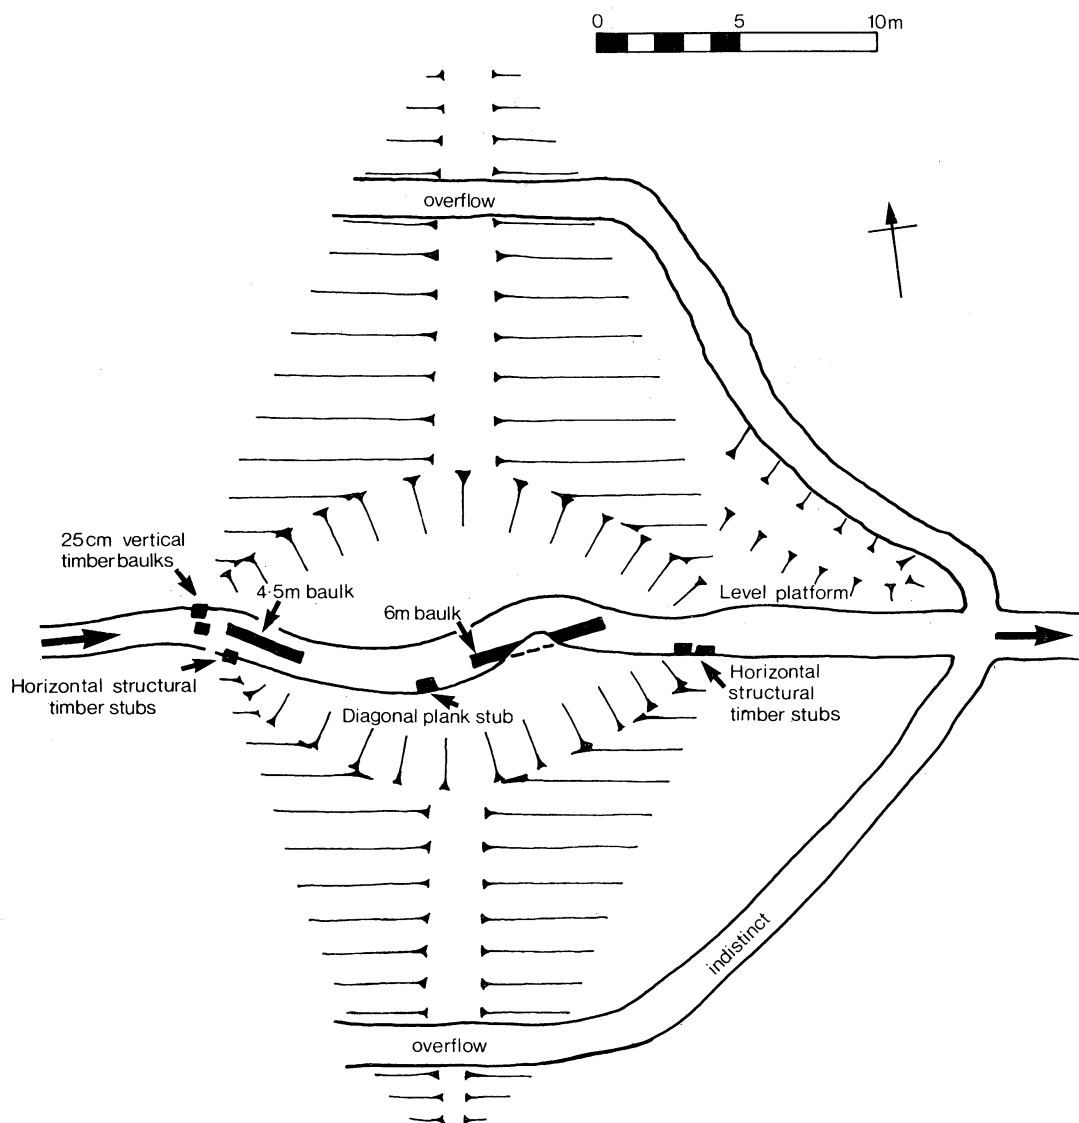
Plan of the subsidiary bay in Frillinghurst Wood
